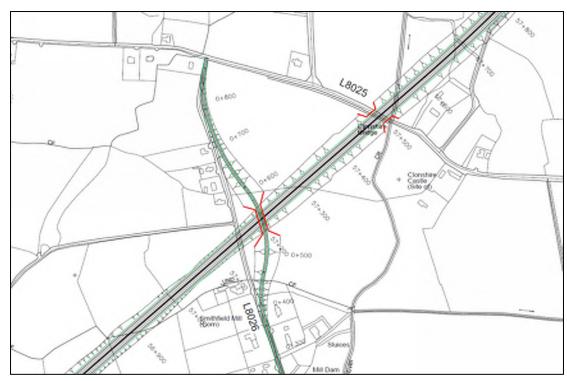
Potential Alternative Road Layout for L-8026 at Clonshire More
